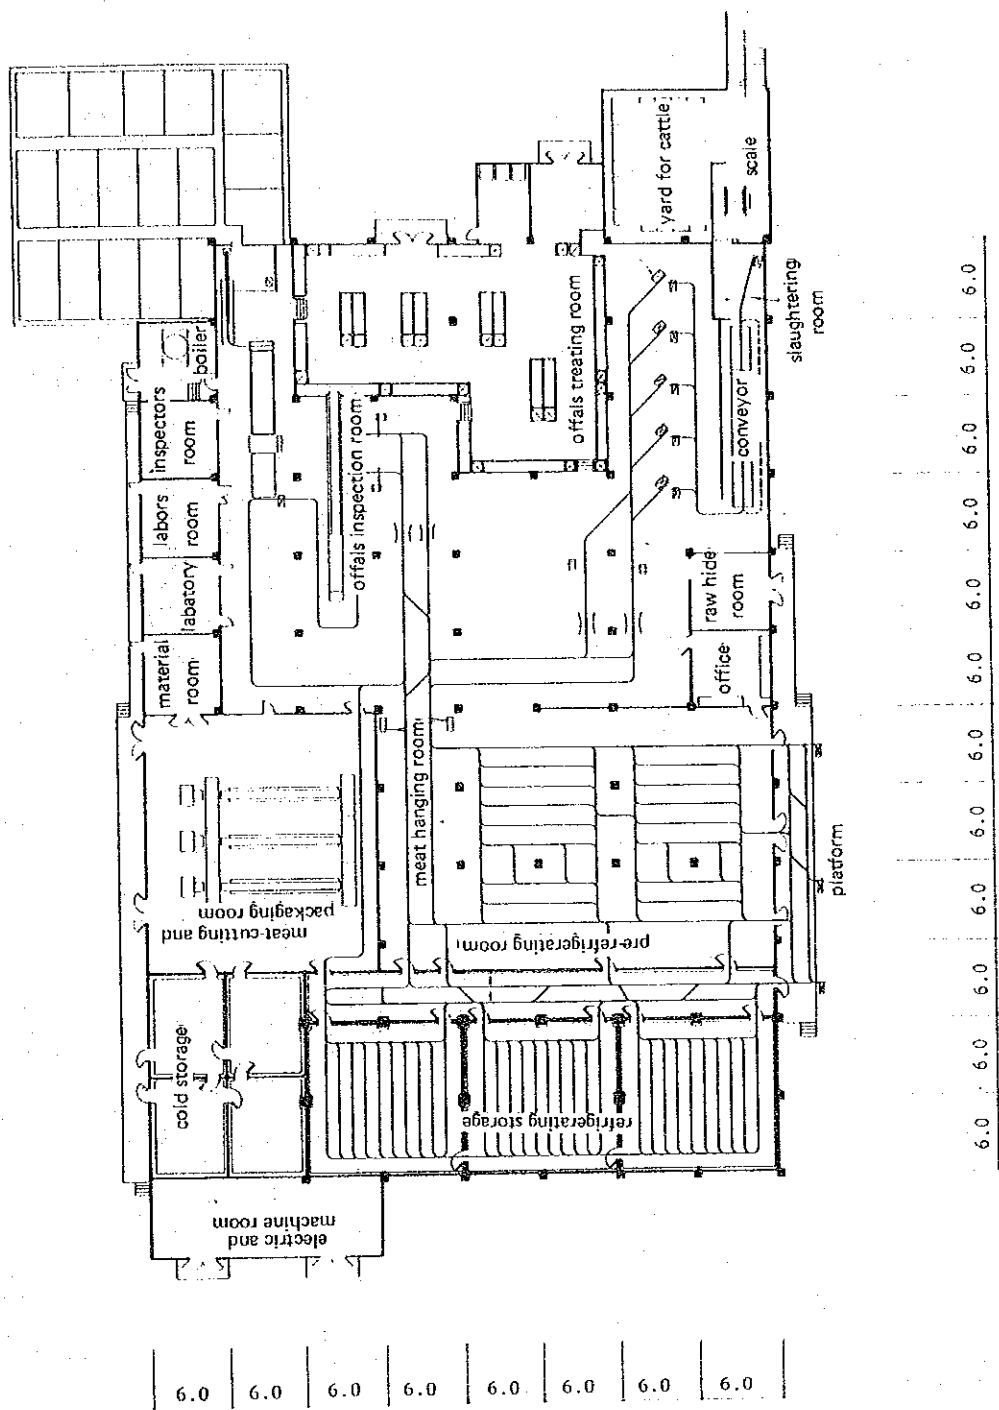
FLOOR PLAN OF SLAUGHTERHOUSE
